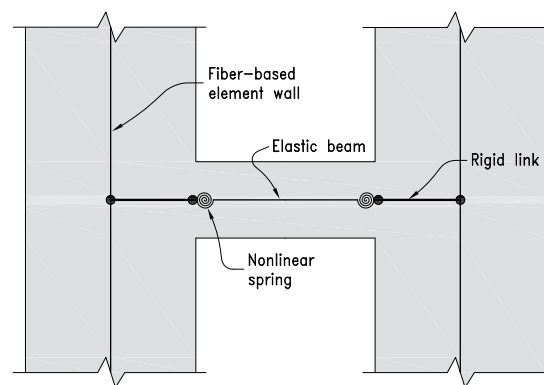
Nonlinear modelling approach of walls and coupling beams.
